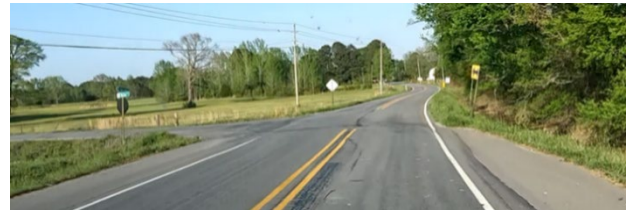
Paved shoulders exist on a section of Batesville Pike south of Fortson Road but not immediately north of Fortson Road.
